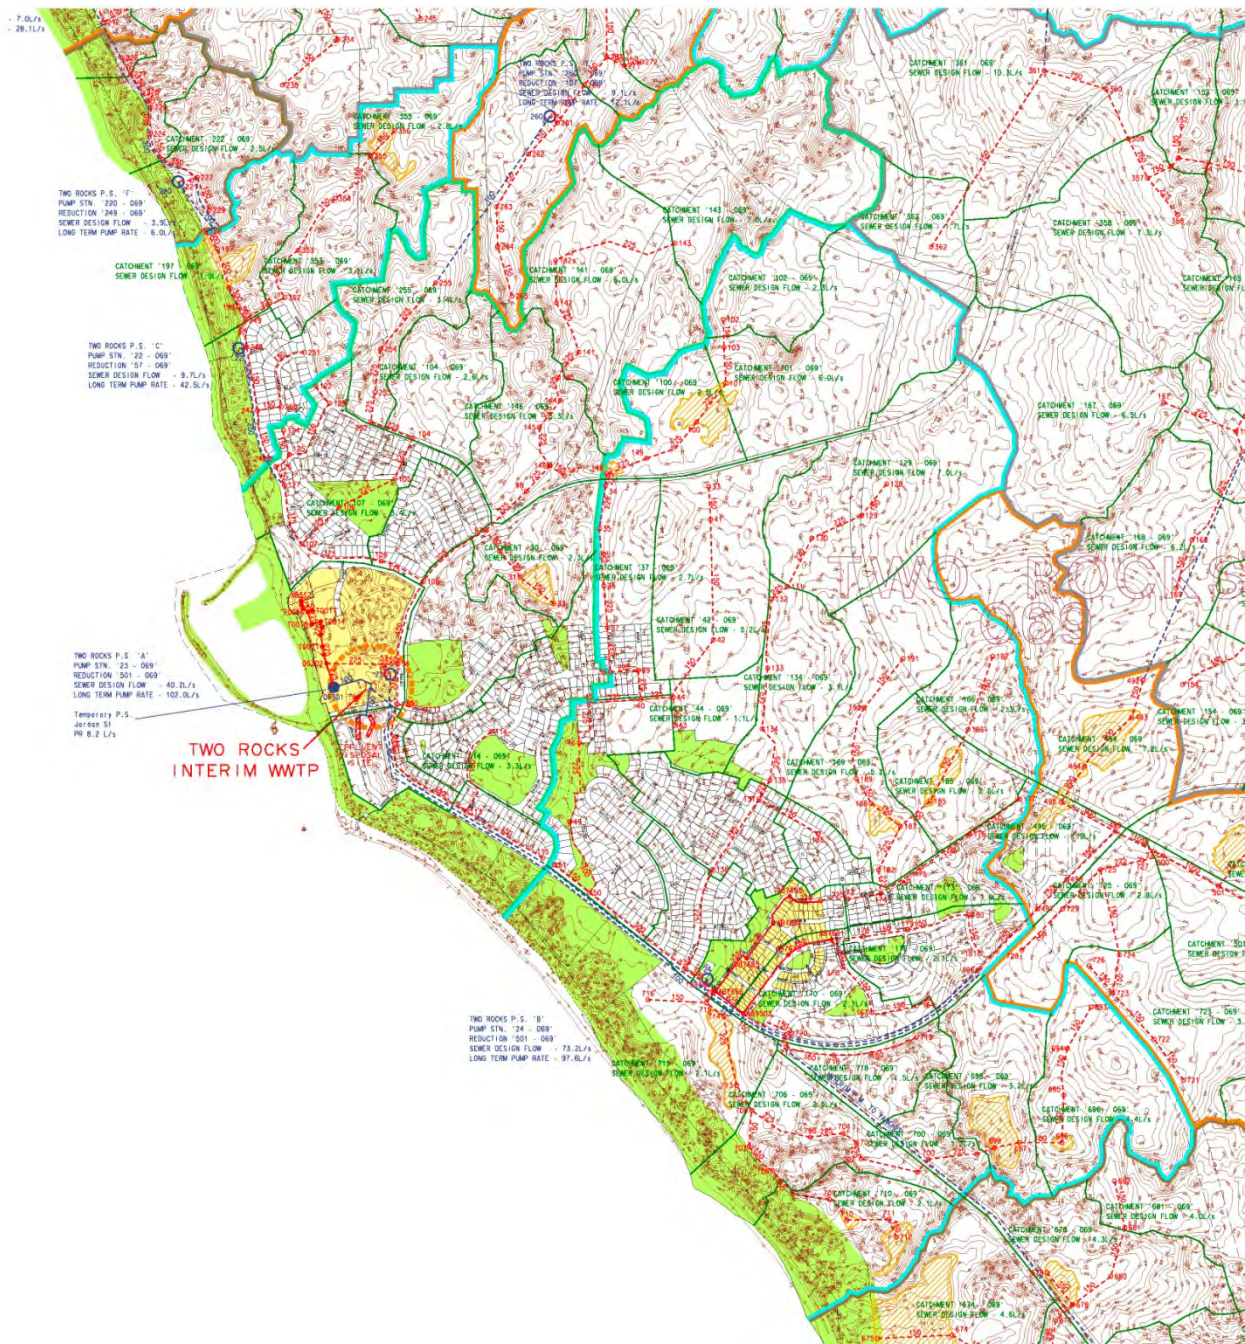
WATER CORPORATION PRELIMINARY SEWER PLANNING
